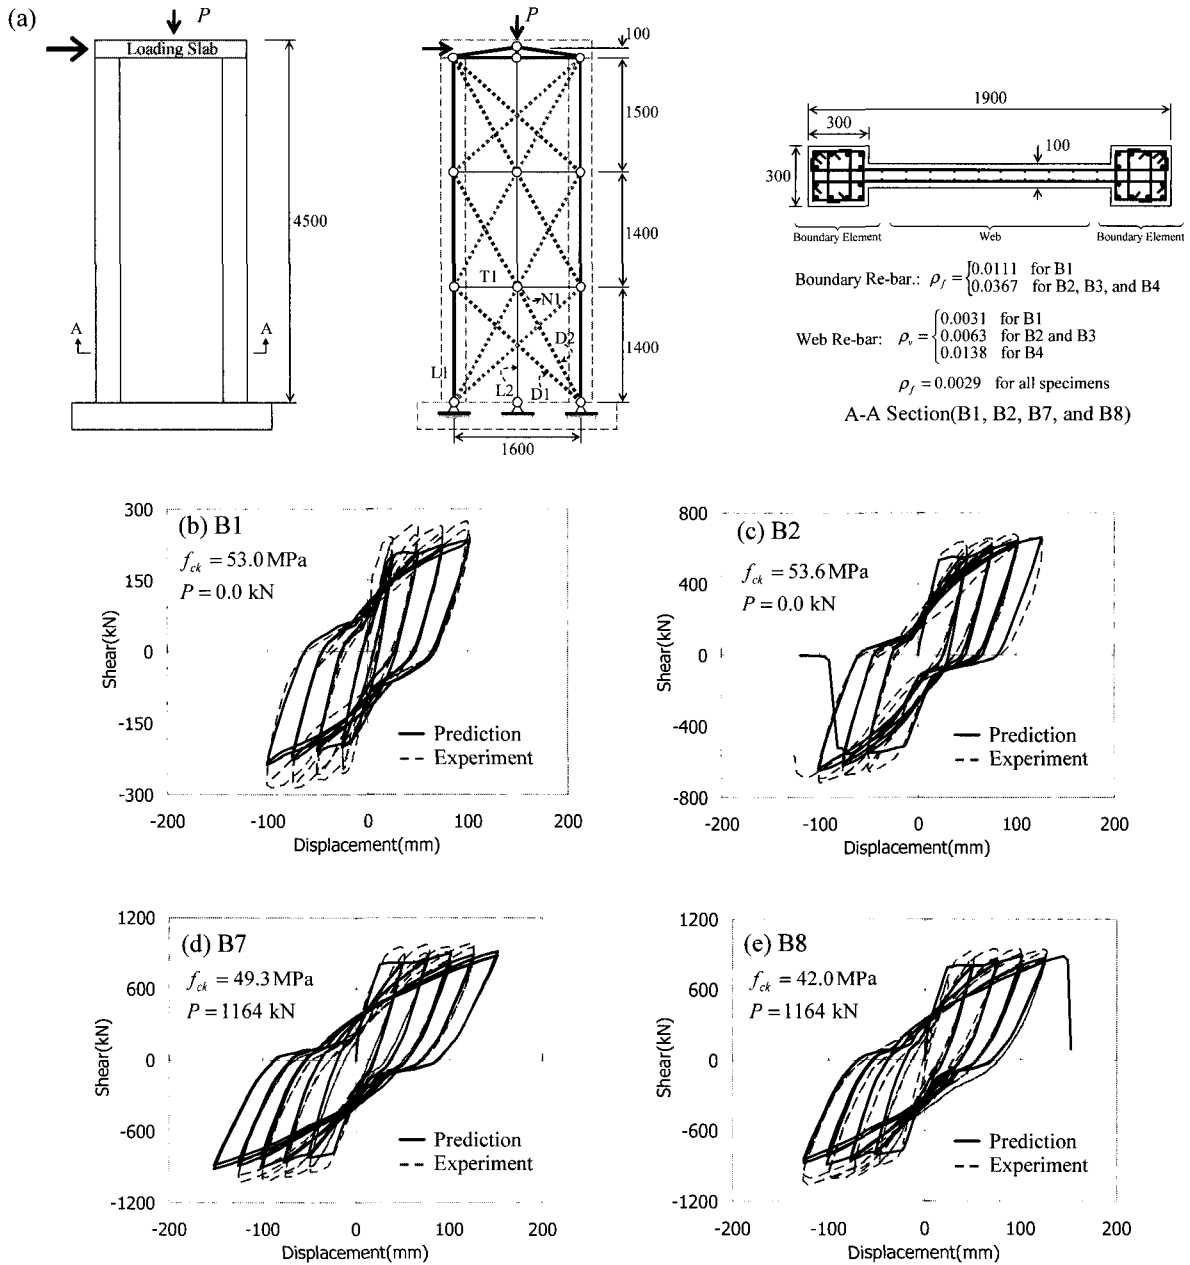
Predictions for slender walls^{29,30}. (a) Details and analytical truss model, (b) B1, (c) B2, (d) B7, and (e) B8
